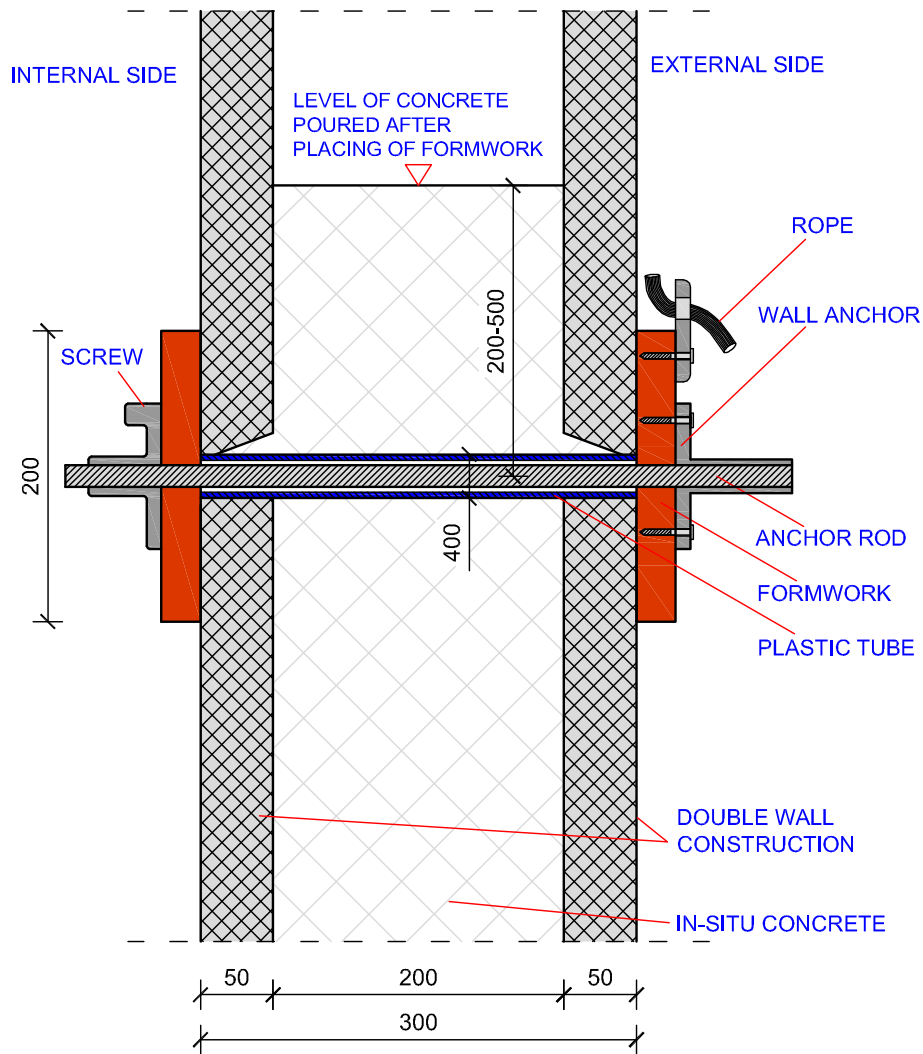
Proposal of formwork for horizontal joint [mm]
